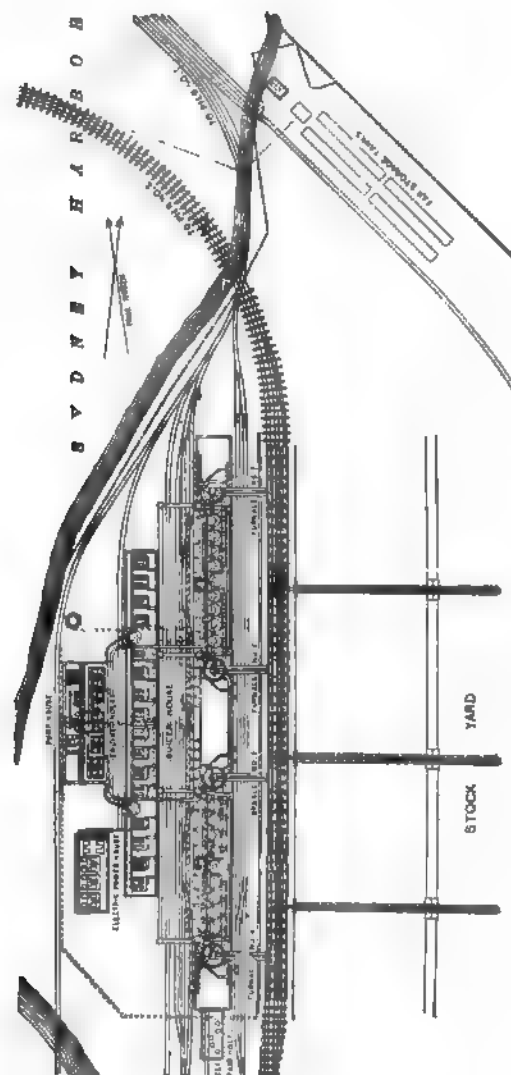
PLAN OF BLAST FURNACE PLANT OF THE DOMINION IRON AND STEEL COMPANY.
